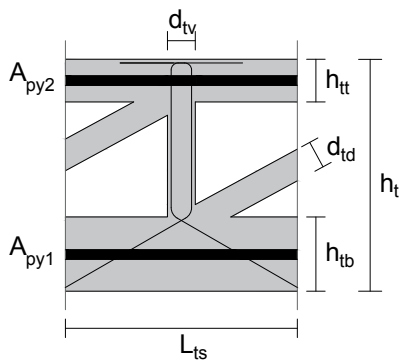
Detail of a middle truss segment with prestressing and suspension reinforcement indicated
